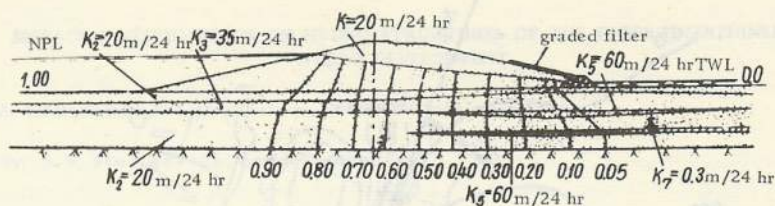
Equipotential lines of the seepage flow in the foundation and body of the left-bank earth dam. Test No. 4
